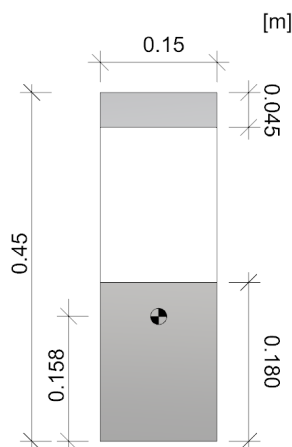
Section through the beam showing dimensions and the center of mass in the beam
